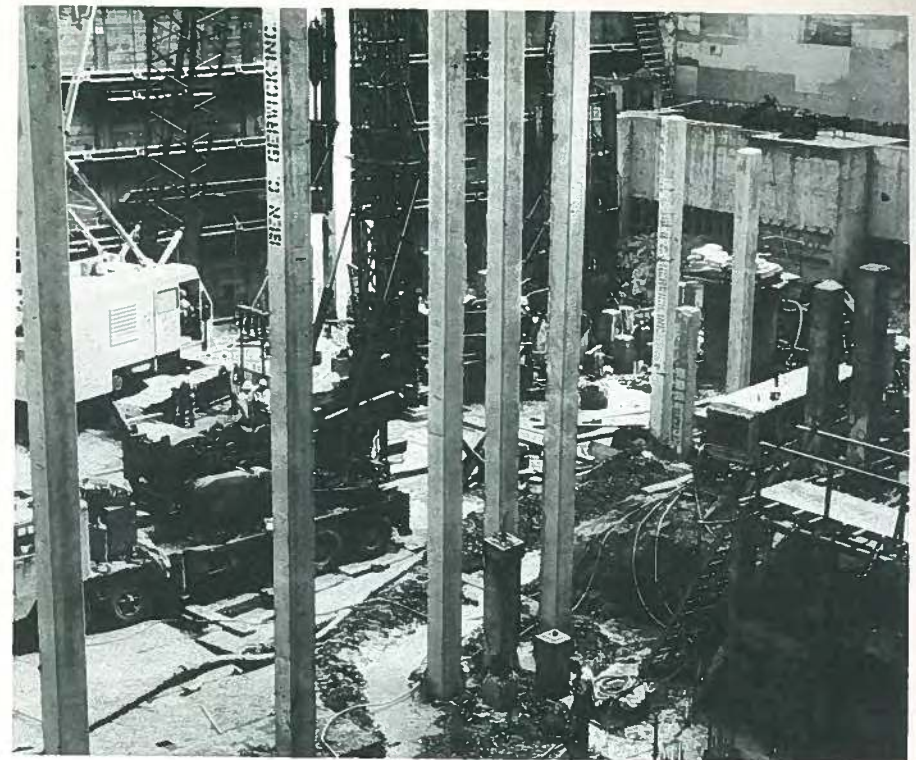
Wells Fargo Building, San Francisco (1957): 138-ft long 20-in. square prestressed concrete piles.
